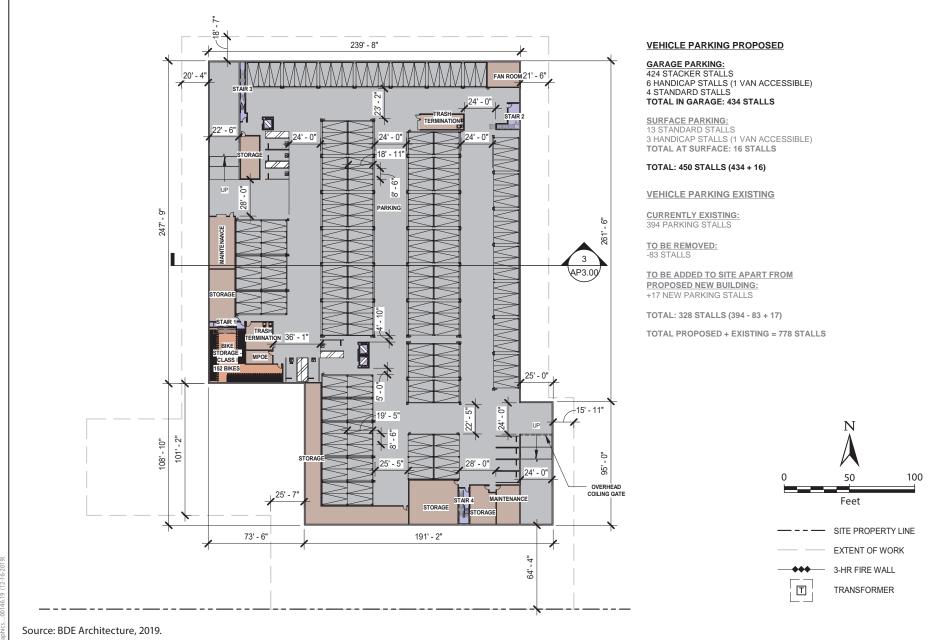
Proposed Basement Plan Laguna Clara II Project
